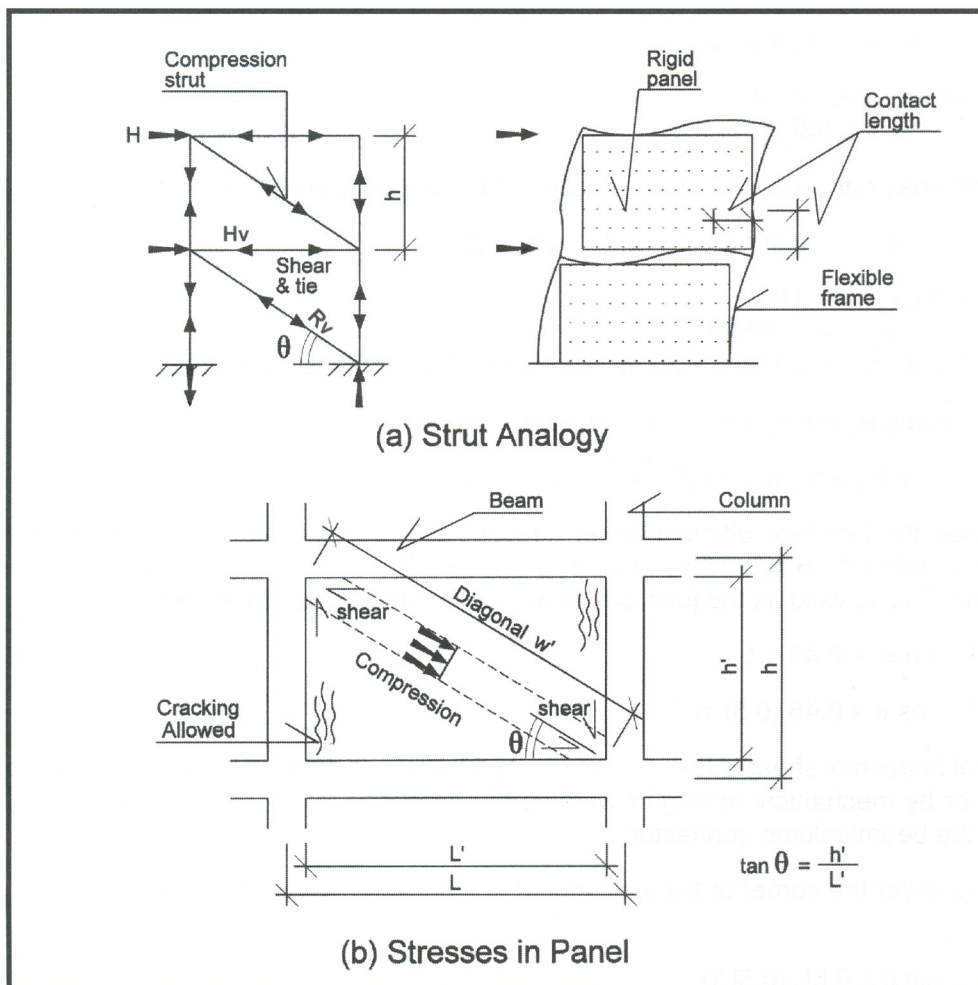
Infill Wall Panel Design Principles (reference 7)
